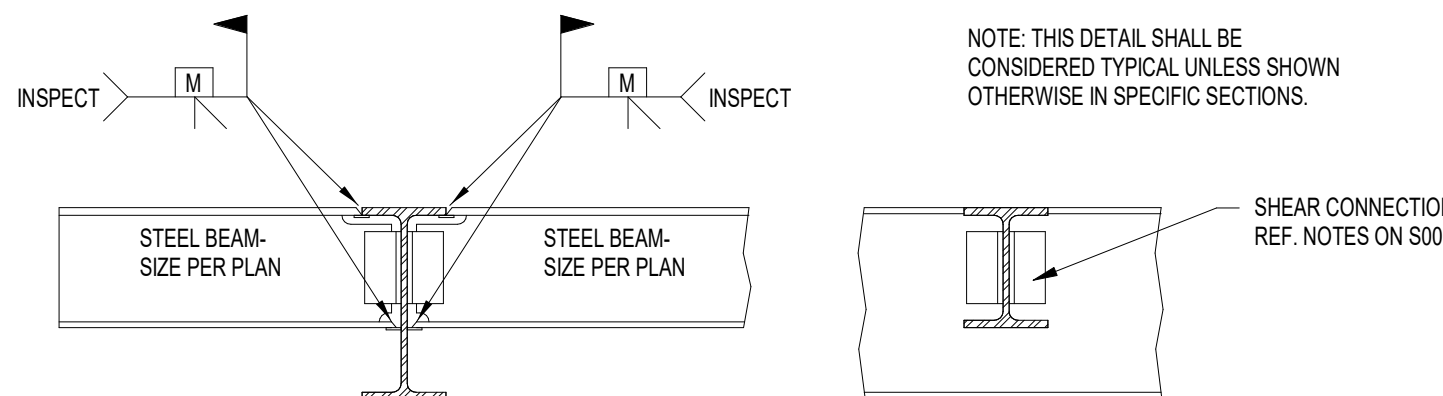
DETAIL B - DEPTH DIFFERENTIAL 6" OR GREATER
